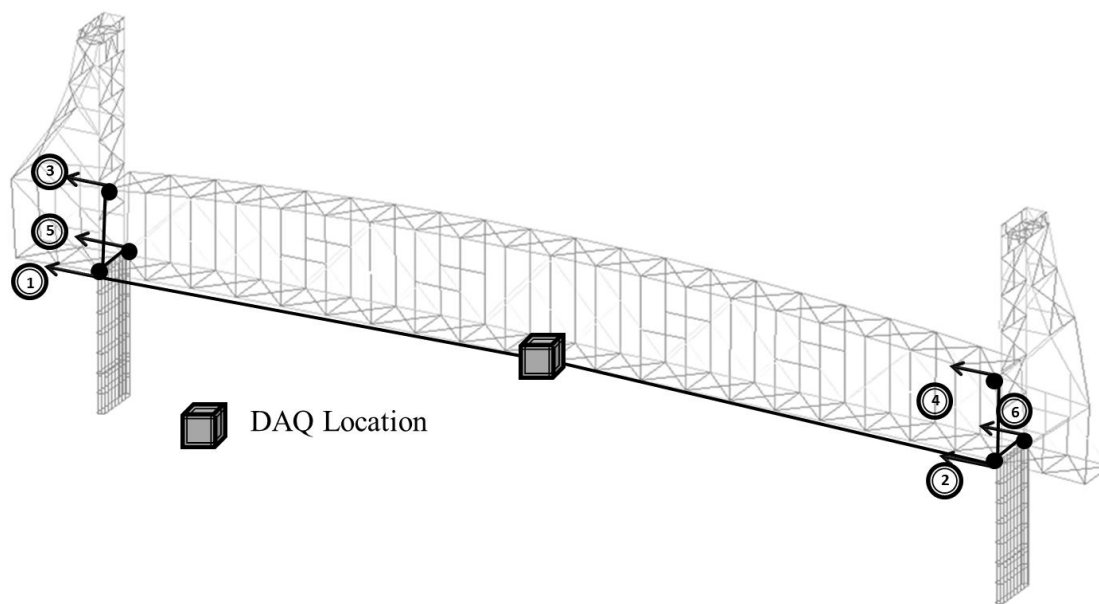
Lift Span Longitudinal Instrumentation Plan
